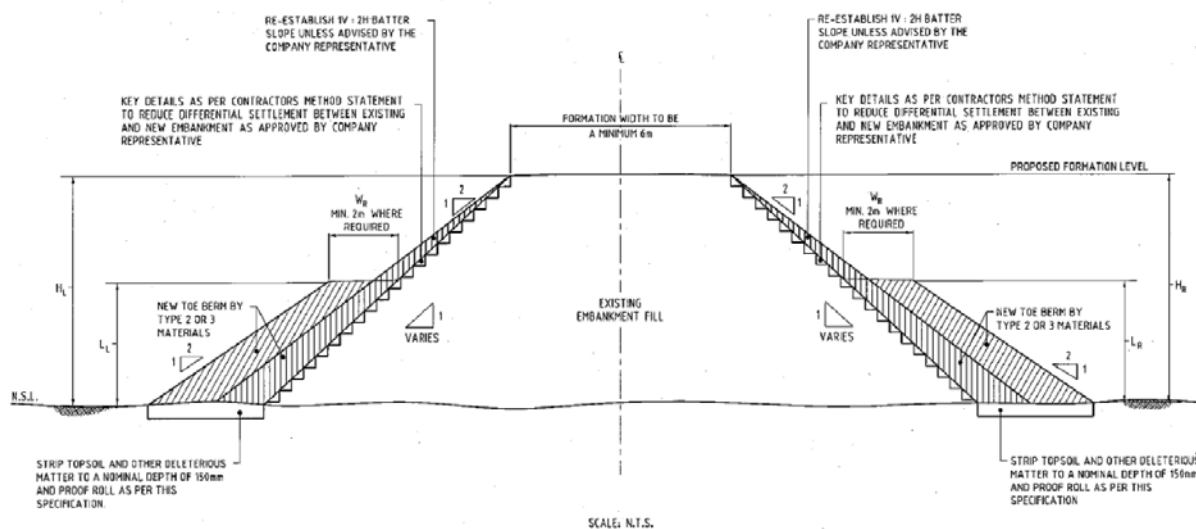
Typical cross-section of existing embankment strengthening – additional berms
